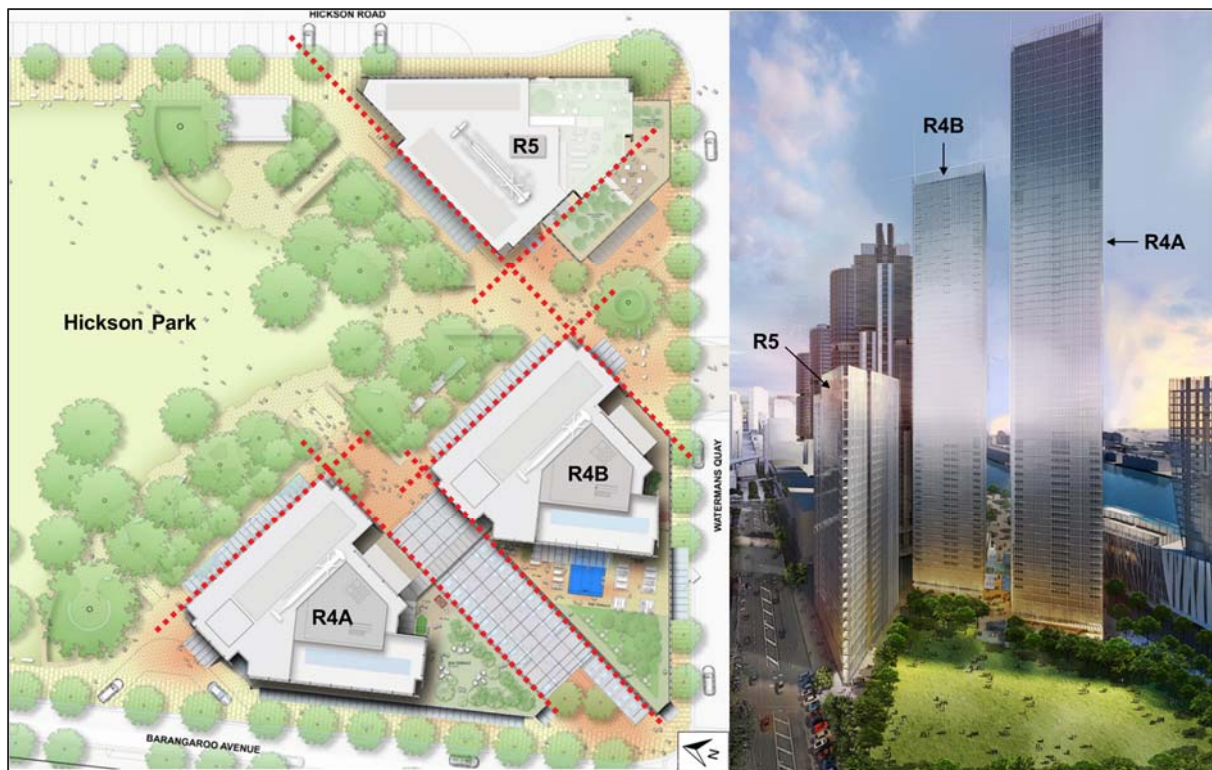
| The layout of approved buildings R4A, R4B and R5 and Hickson Park within Block 4 Barangaroo South (Base source: SSD 6966)
